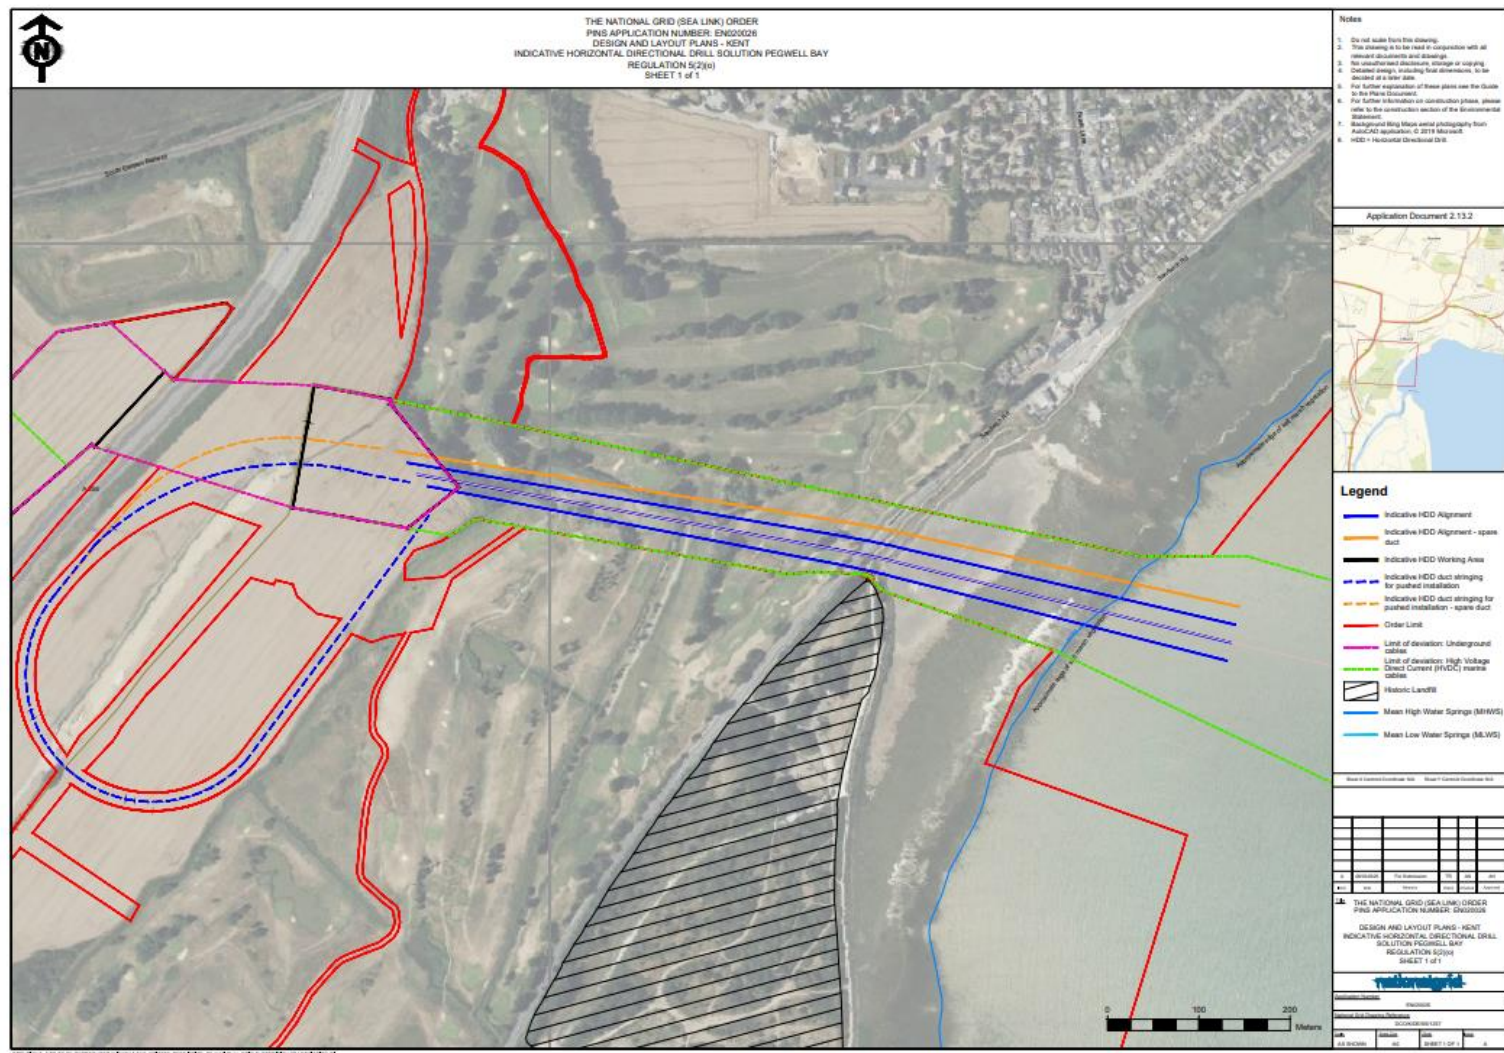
Application Document 2.13.2 Design and Layout Plans – Kent Indicative Horizontal Direction Drill Solution Pegwell Bay [APP-037].
